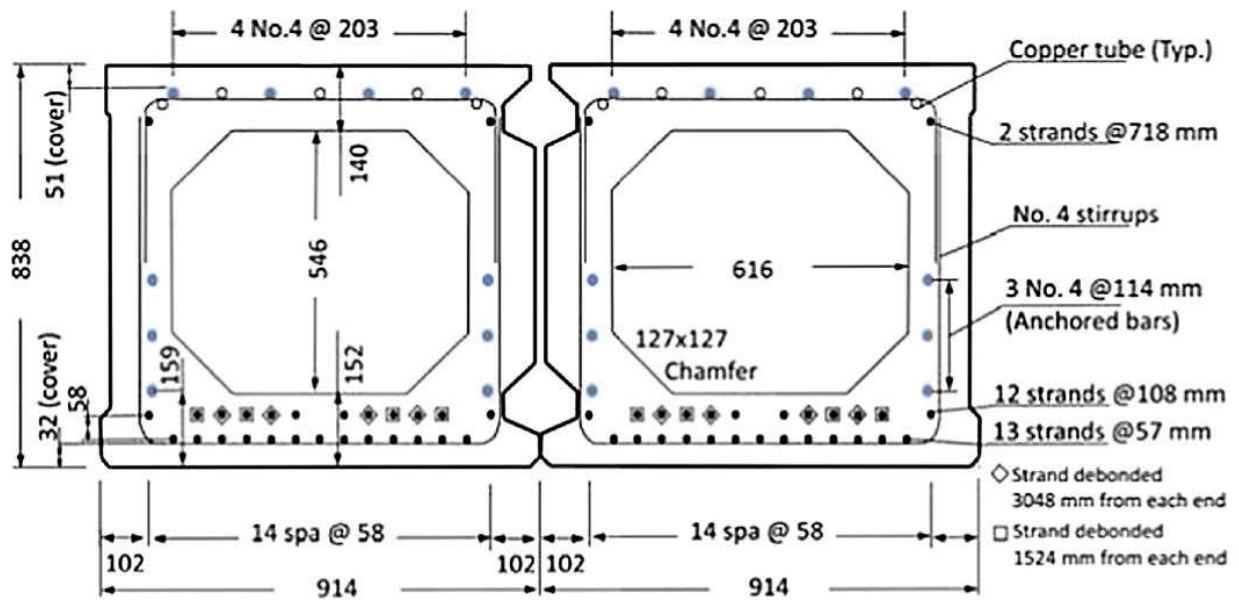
Cross-sectional view of box girders used for FHWA beam splice test (Maya and Graybeal 2017).
